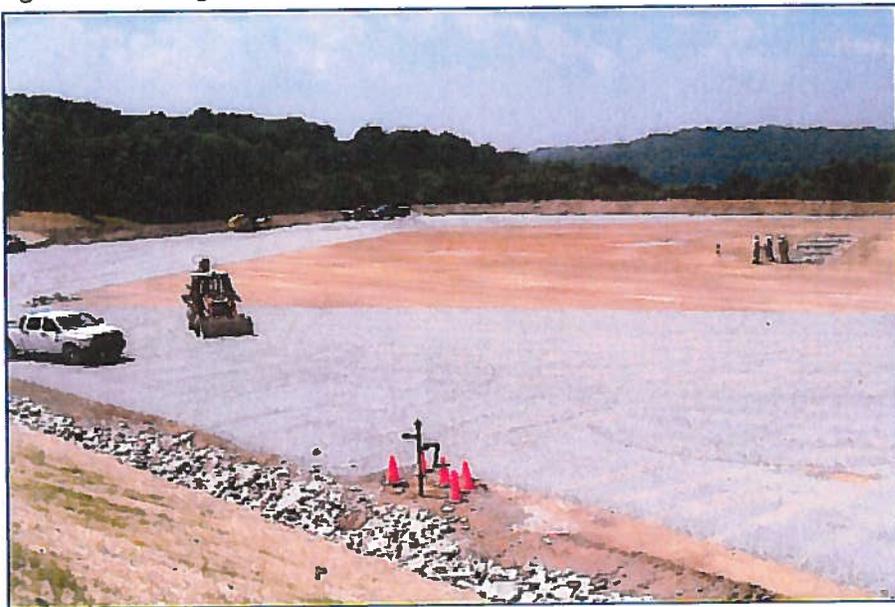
Construction of impoundment and access road. Hydroseed applied to embankment.
